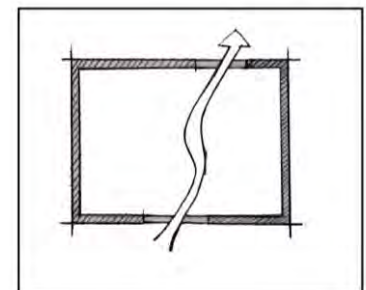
Ventilation: Plan shows Cross ventilation is indispensable.
